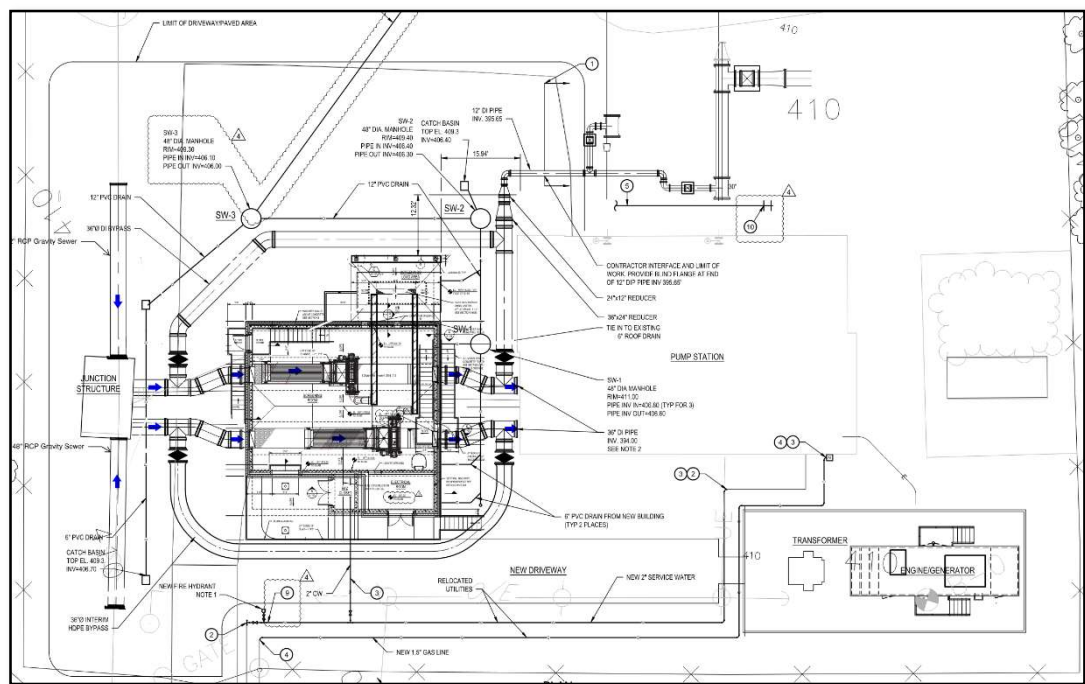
Sanitary Screening Facility – Existing Screening Building and Site
